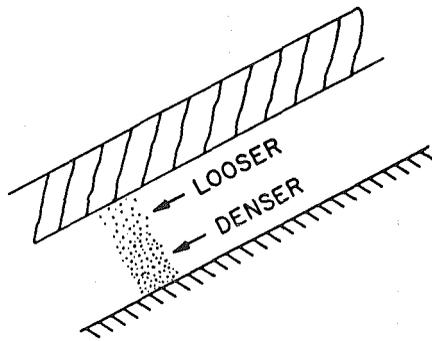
Example of Potential Situation for Mechanism B Failure Arising from Rearrangement of Soil Into Looser and Denser Zones
